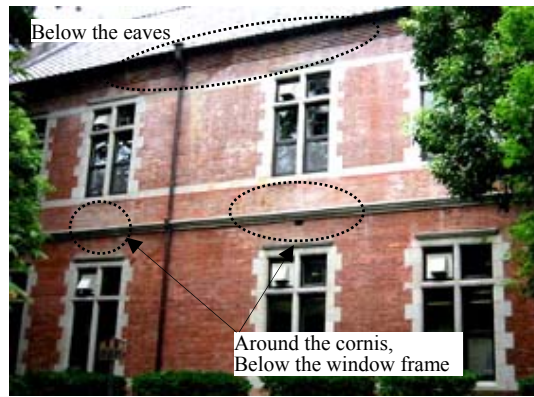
Efflorescence on a historical masonry building reinforced with concrete
